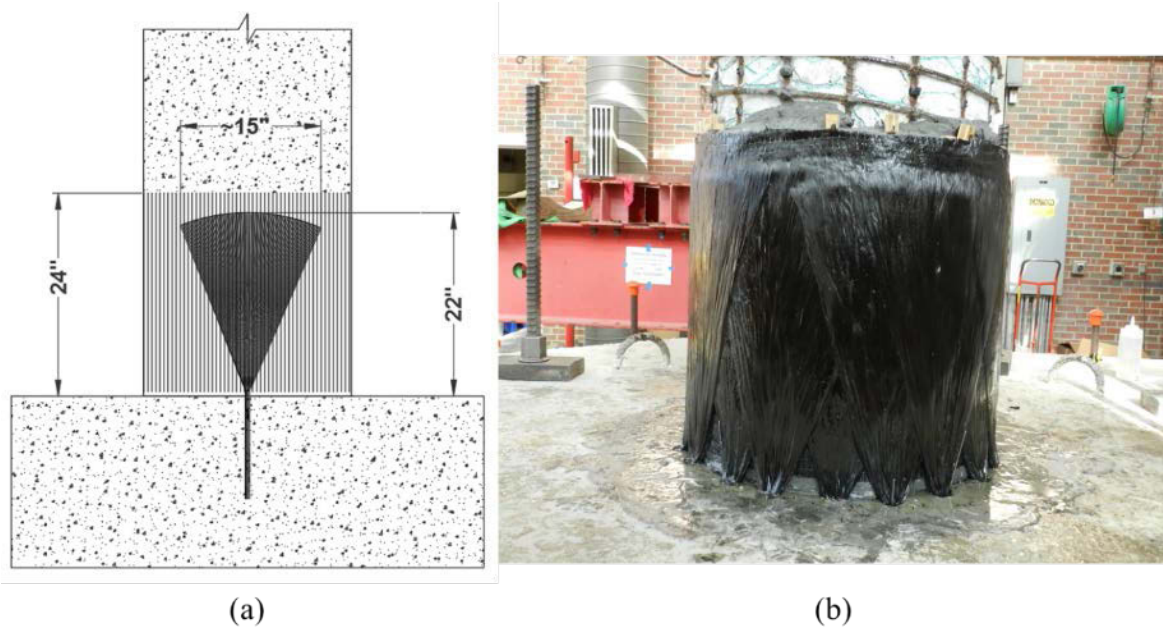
a) CFRP Anchor Detail b) A view of Installed CFRP Anchors
